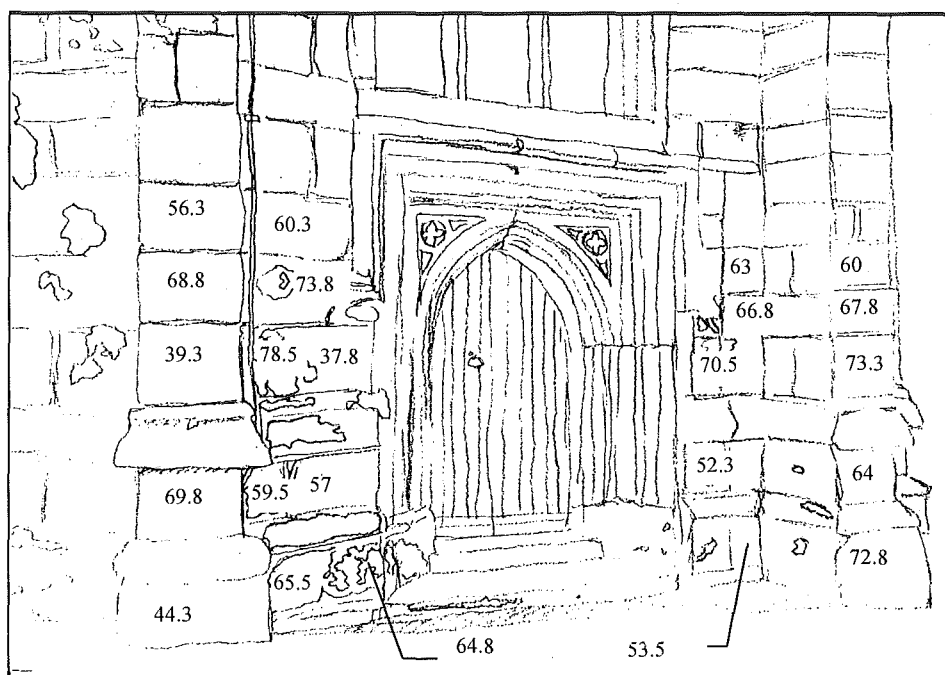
Sketch plan of Peter Tavy Church, West facing wall.
